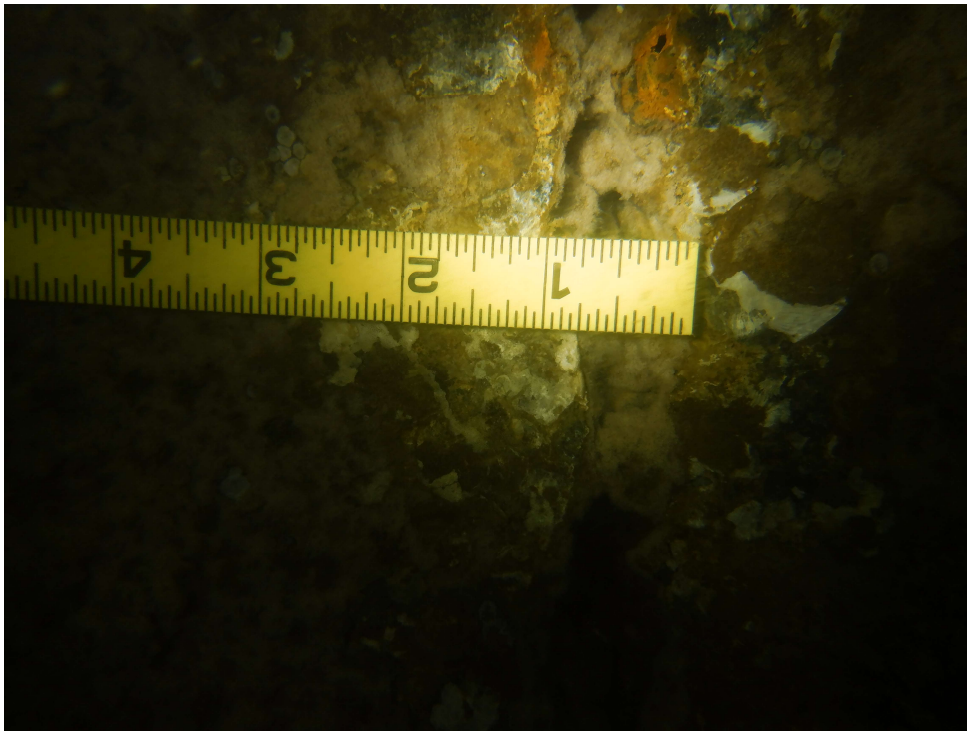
BSB101 Pile C – Minor Cracking in South Face (Looking North)
